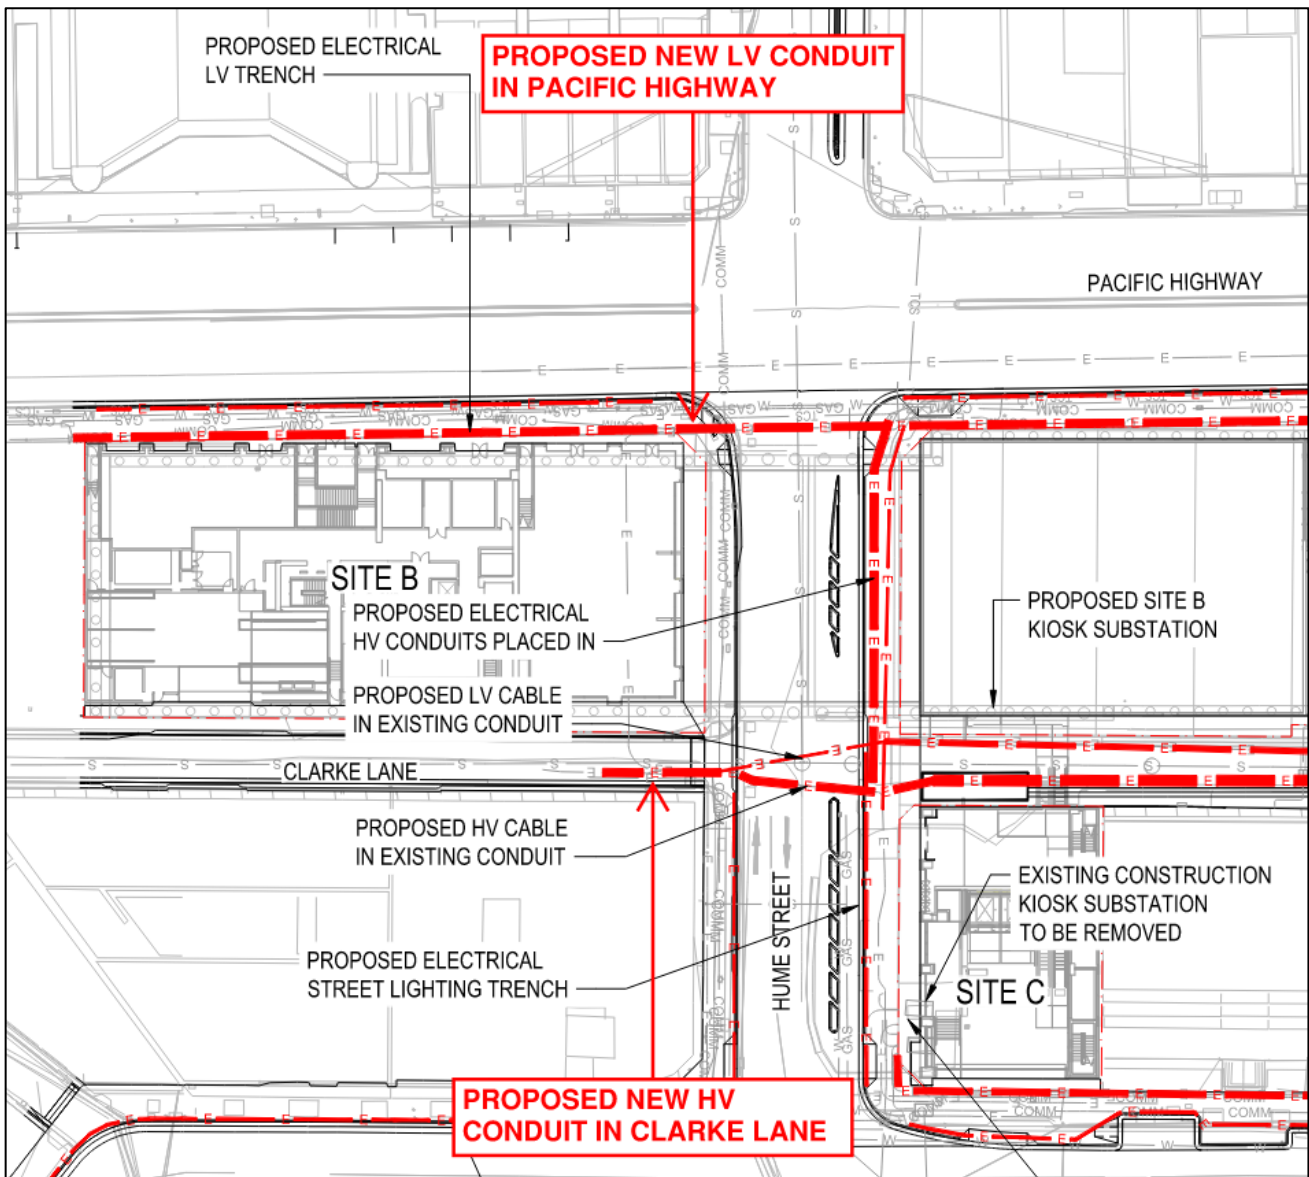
Sydney Metro Crows Nest – Proposed Utilities Plan – showing proposed new LV and HV Conduits along site frontage, denote in red
